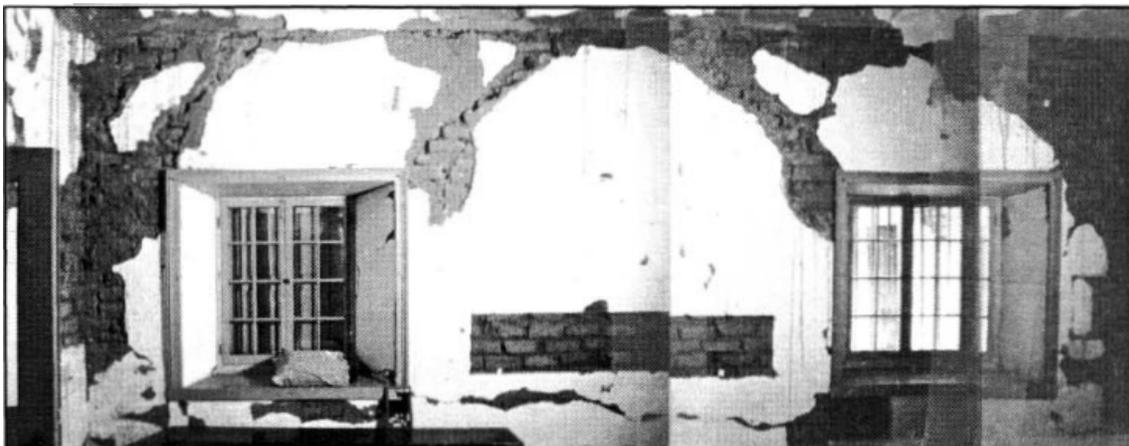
Interior elevation of the east wall of Room 8. This wall was repaired in 1991 with an adobeflyash grout and appears to have suffered little additional damage in the Northridge earthquake (Tolles et al., 1996).
